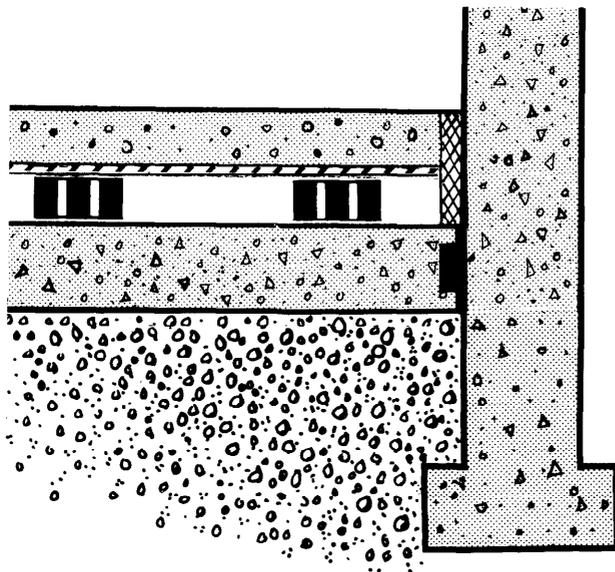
CEILING AND FLOOR CONSTRUCTION, NOISE CONTROL
